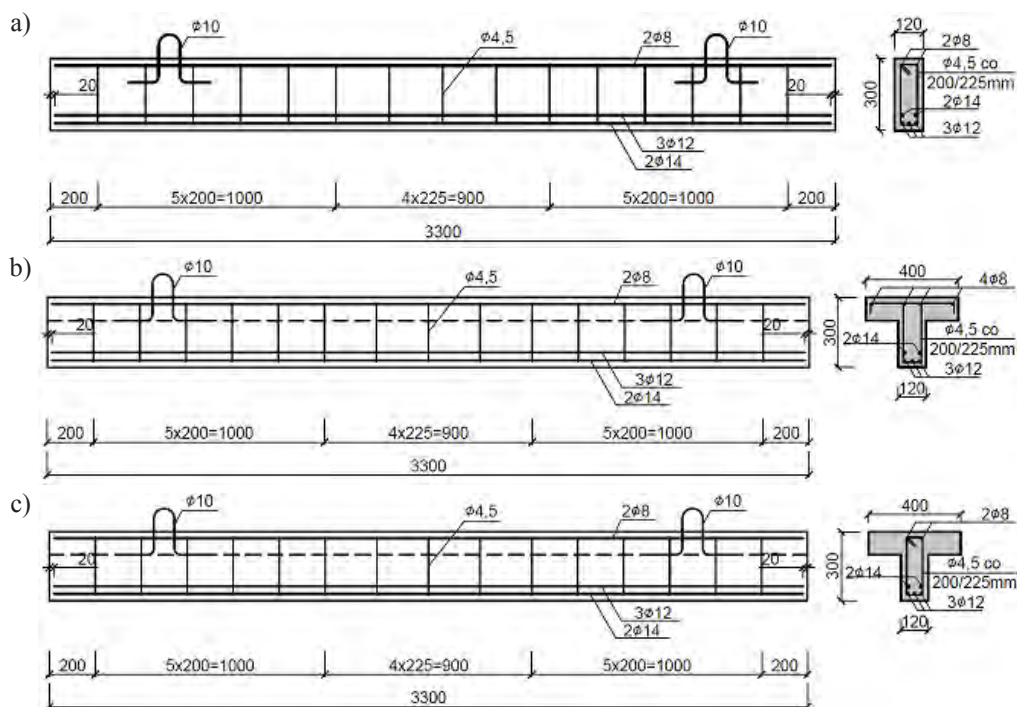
The structure of reinforcement concrete beams: a) S2M, b) S2T, c) S2T1
